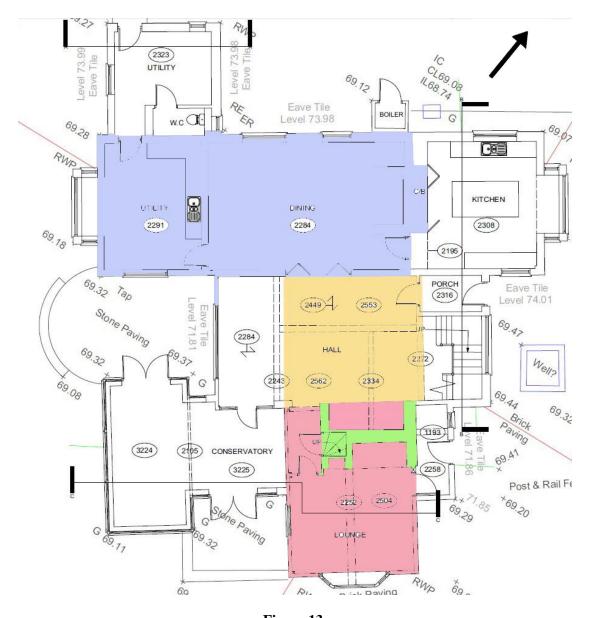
Ground plan by Wincer Kievenaar Architects adapted to highlight the principal phases of construction in colour.
